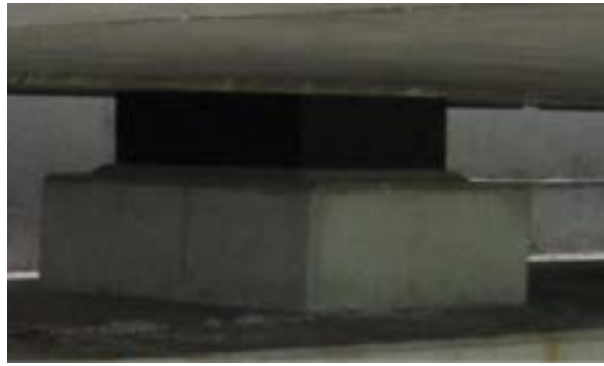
View of a mortar bed and neoprene bearings on a precast pier beam accommodating the slope of the girders.
